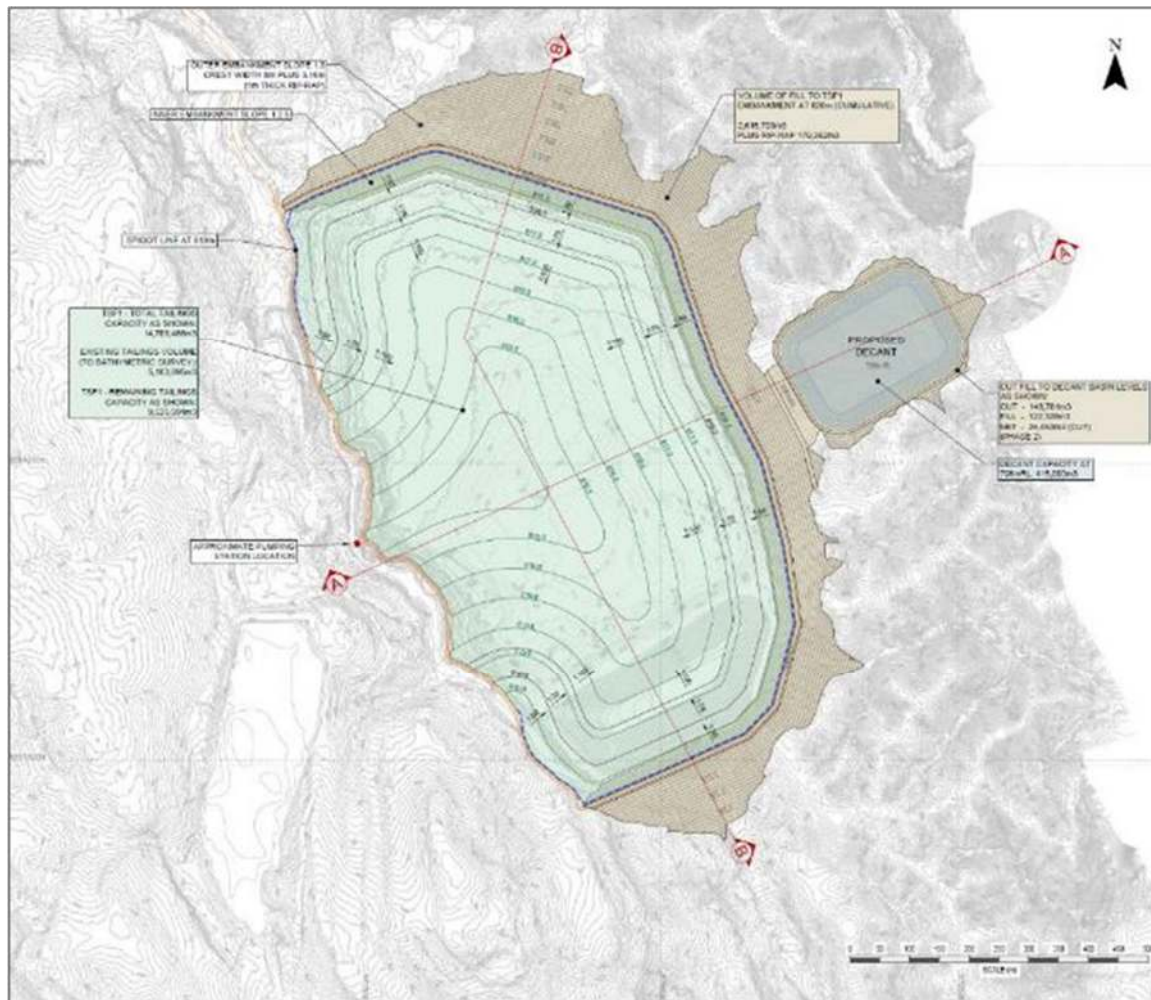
Ultimate TSF1 Configuration Plan (Elevation 820mRL)
